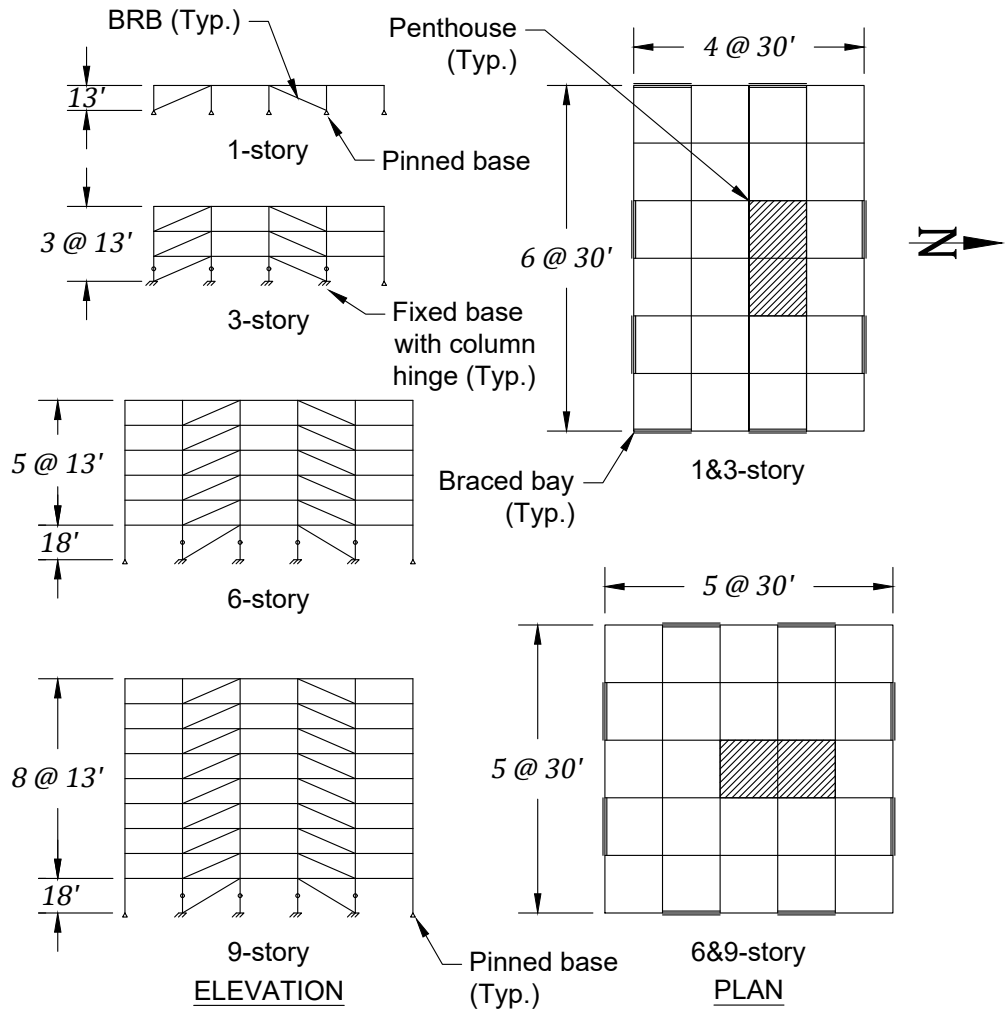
Floor plan and elevation for archetype buildings (LB brace configuration shown)
